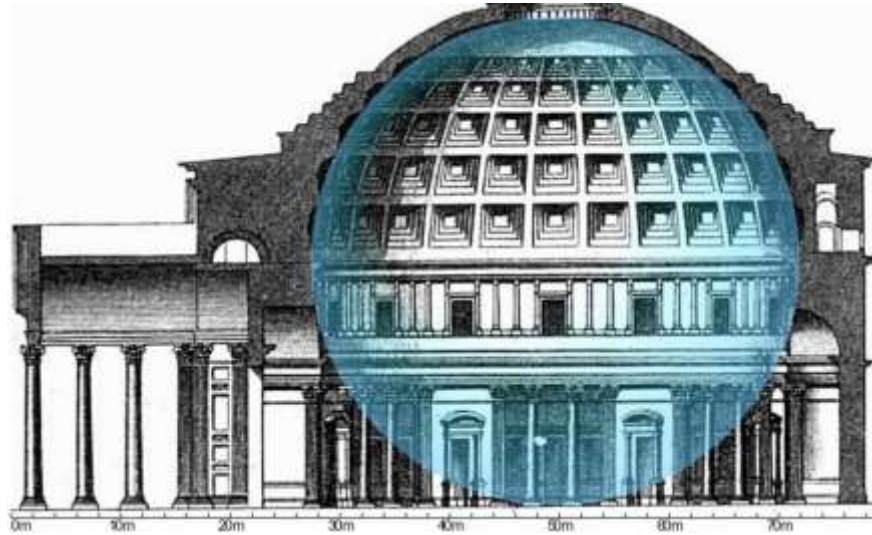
Cross-section of Pantheon - built in 27 B.C. [9]
